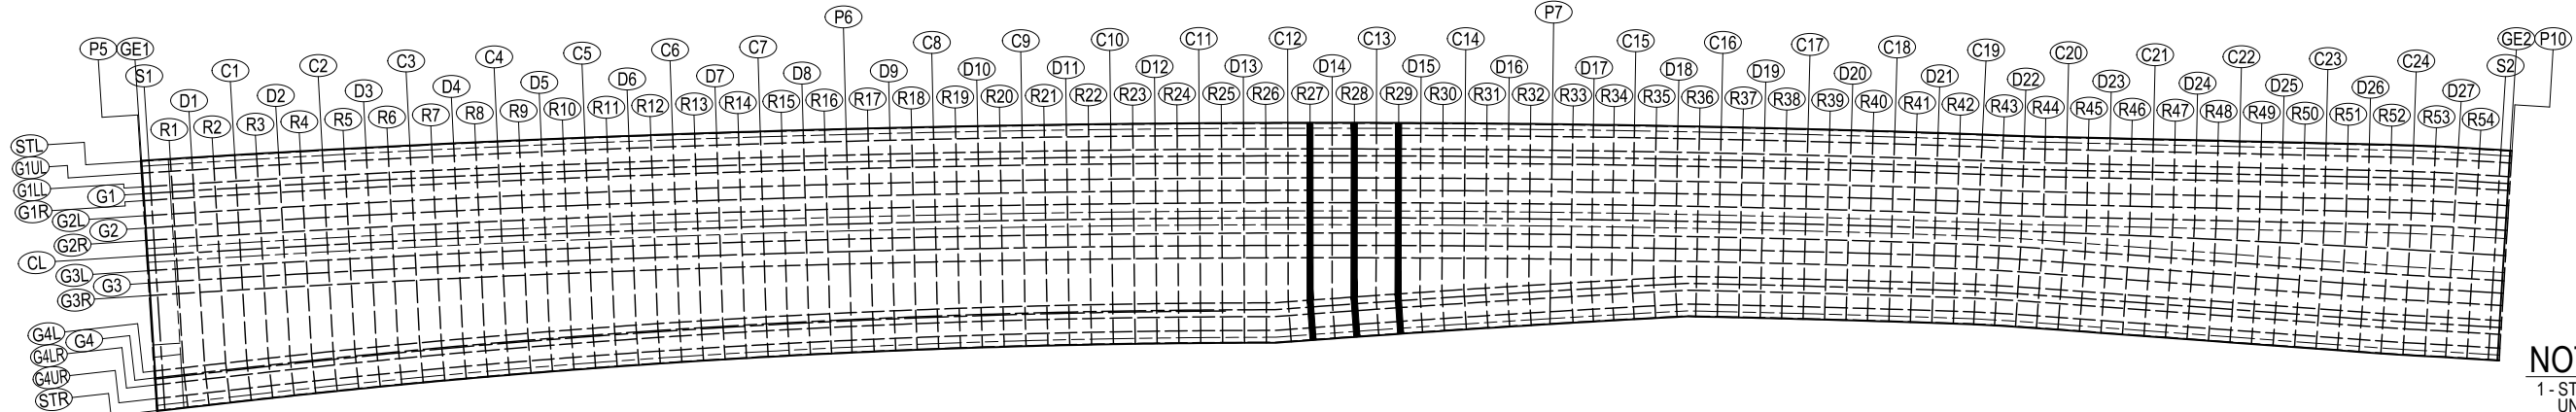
DETAIL OF CROSS BEAM SECTION (8) S=1:60 R27 TO R29 (2)
